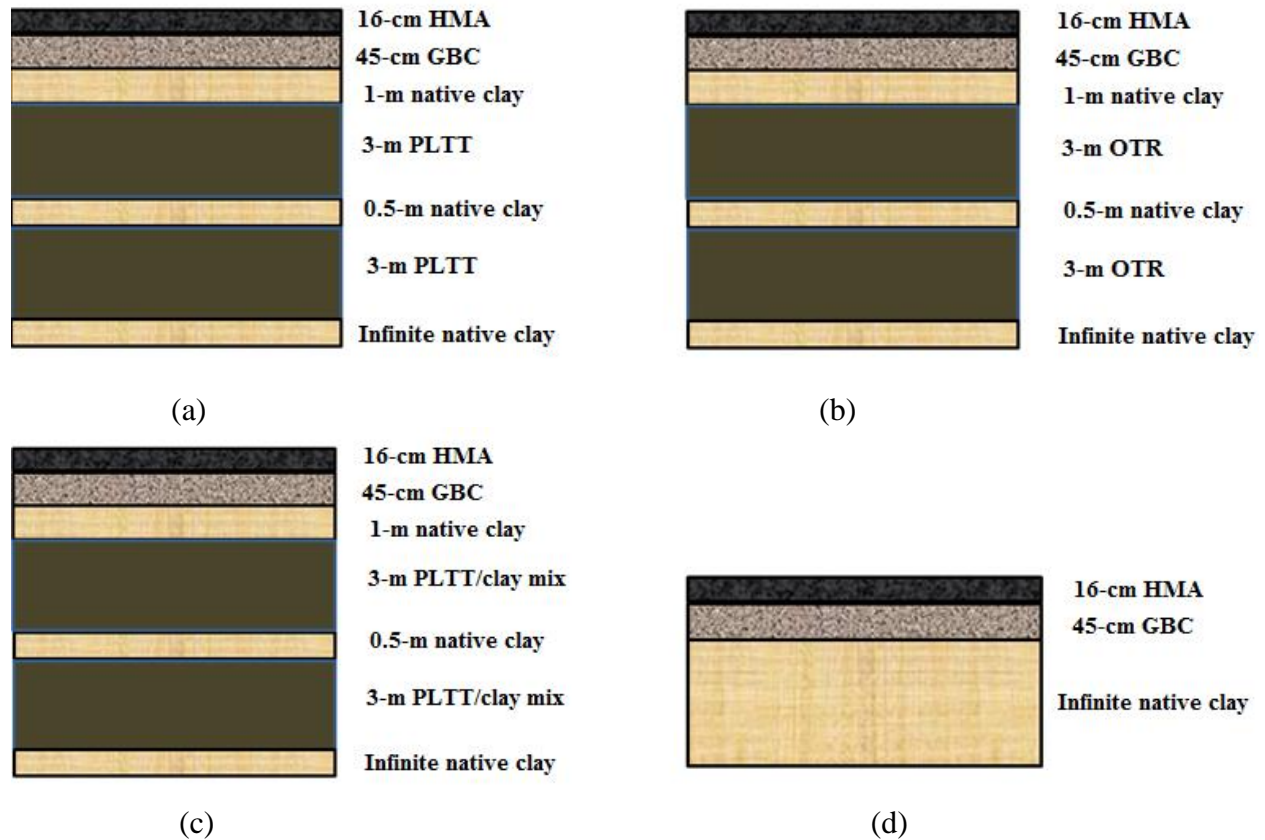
Schematic presentation of the pavement structure for the (a) PLTT section, (b) OTR section, (c) PLTT-soil mixture section and (d) Native soil test section.
